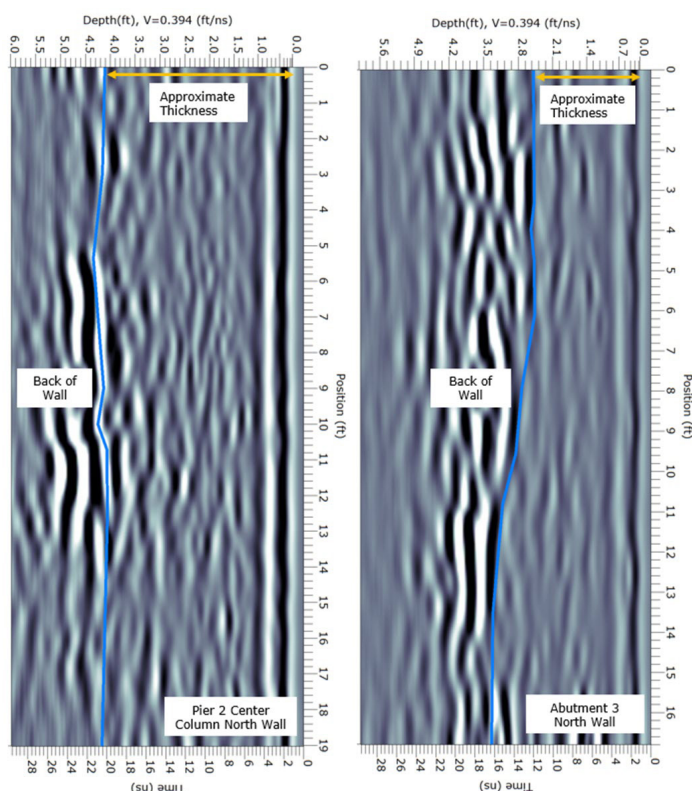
GPR cross-sectional data showing the approximate mean column thickness (4.12 ft) observed on the North Wall Center Column above Pier 2 (Left) and varying wall thickness at Abutment 3 confirming the existing of batter (Right).
